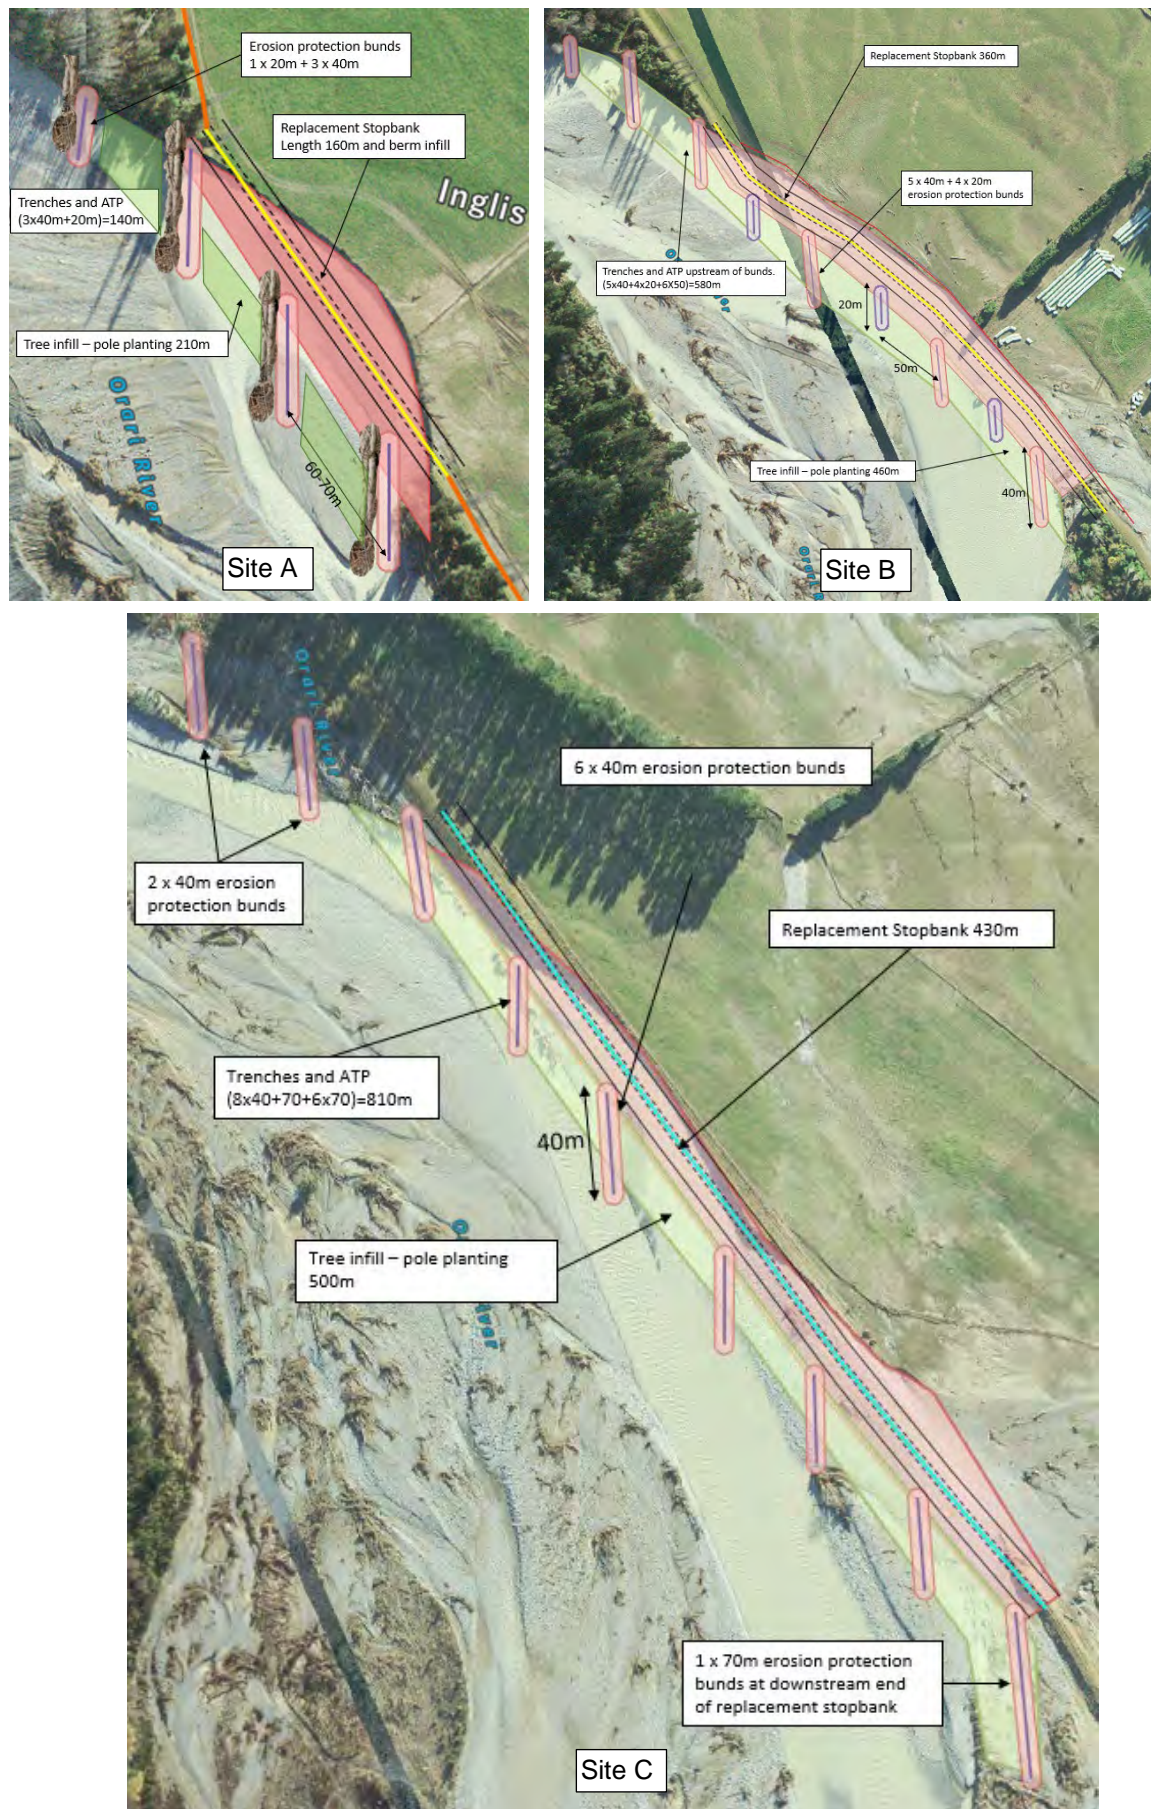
Orari at Inglis Road, flood repair design for sites A, B and C.
